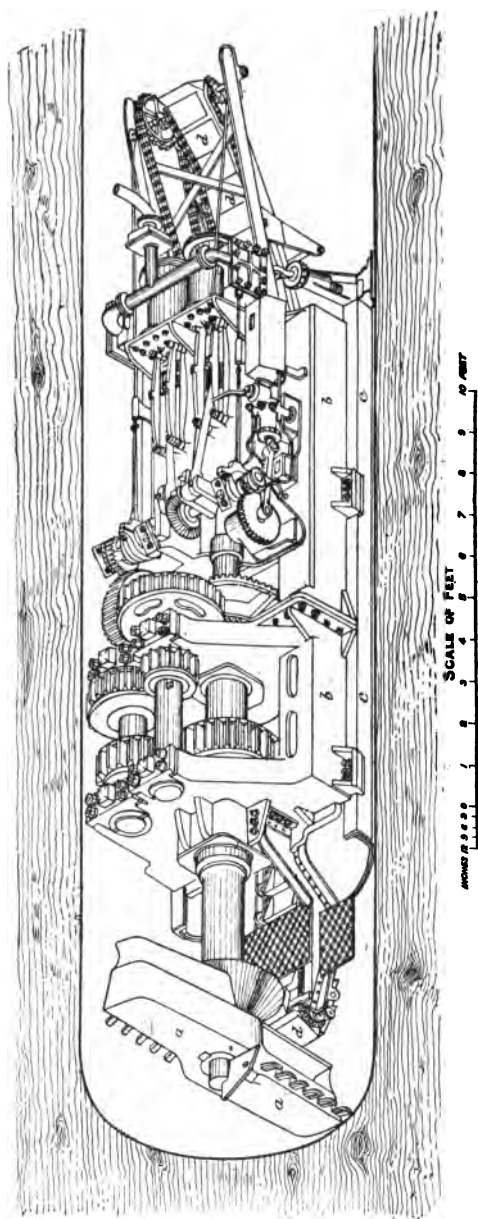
Section of the present heading under the sea at Dover, showing the air-boring machine of Colonels Beaumont and English in isometrical perspective.
